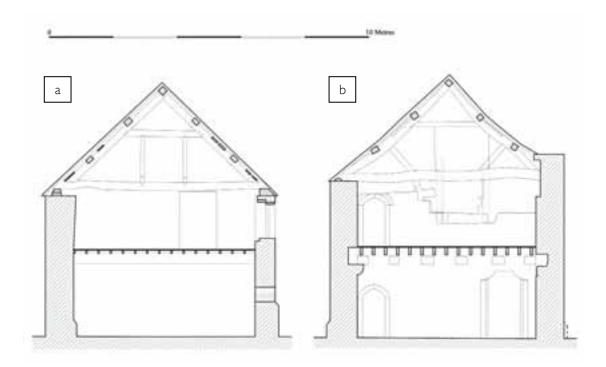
a) Truss T4, floor and section from NW Farm Building, and b) Truss T5, floor and section from Solar Wing, both of Storeton Hall Farm outbuilding. Based on a figure supplied by Mark Fletcher, Matrix Archaeology
